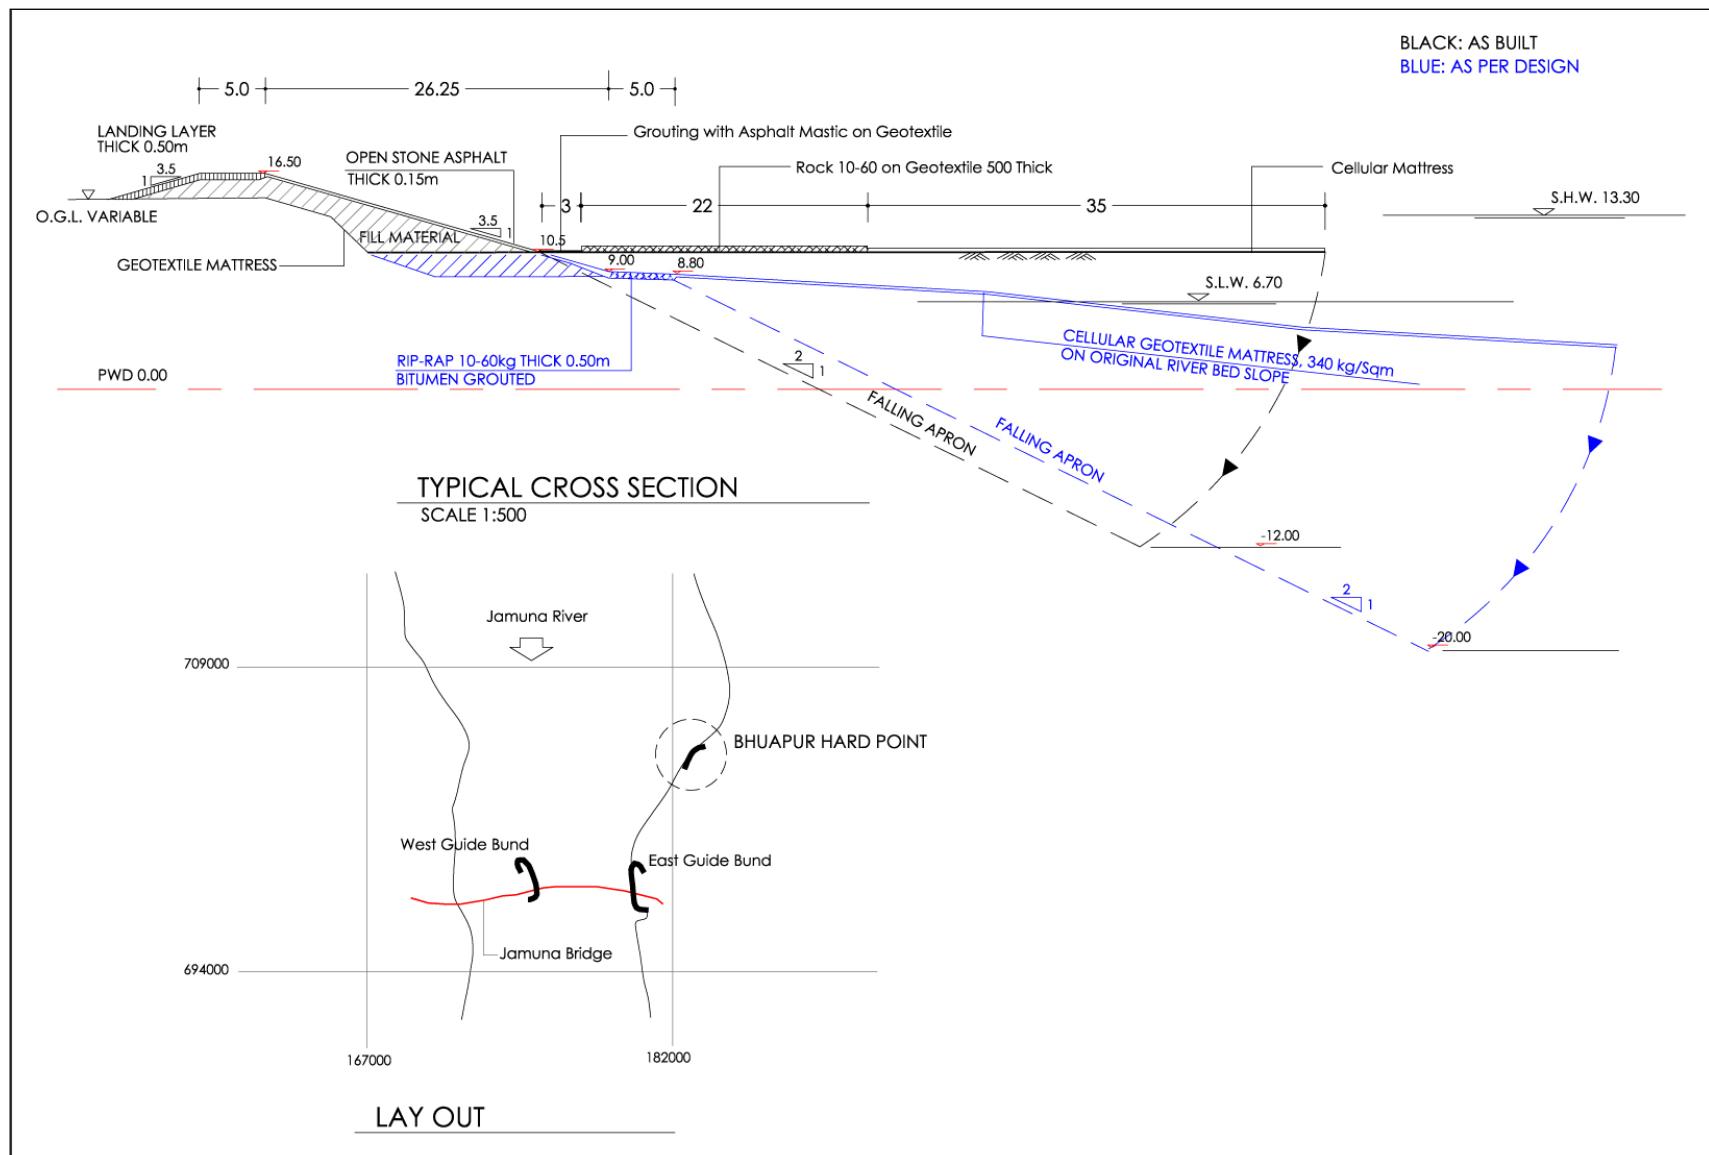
Typical cross-section and layout of Bhuapur hard point..
